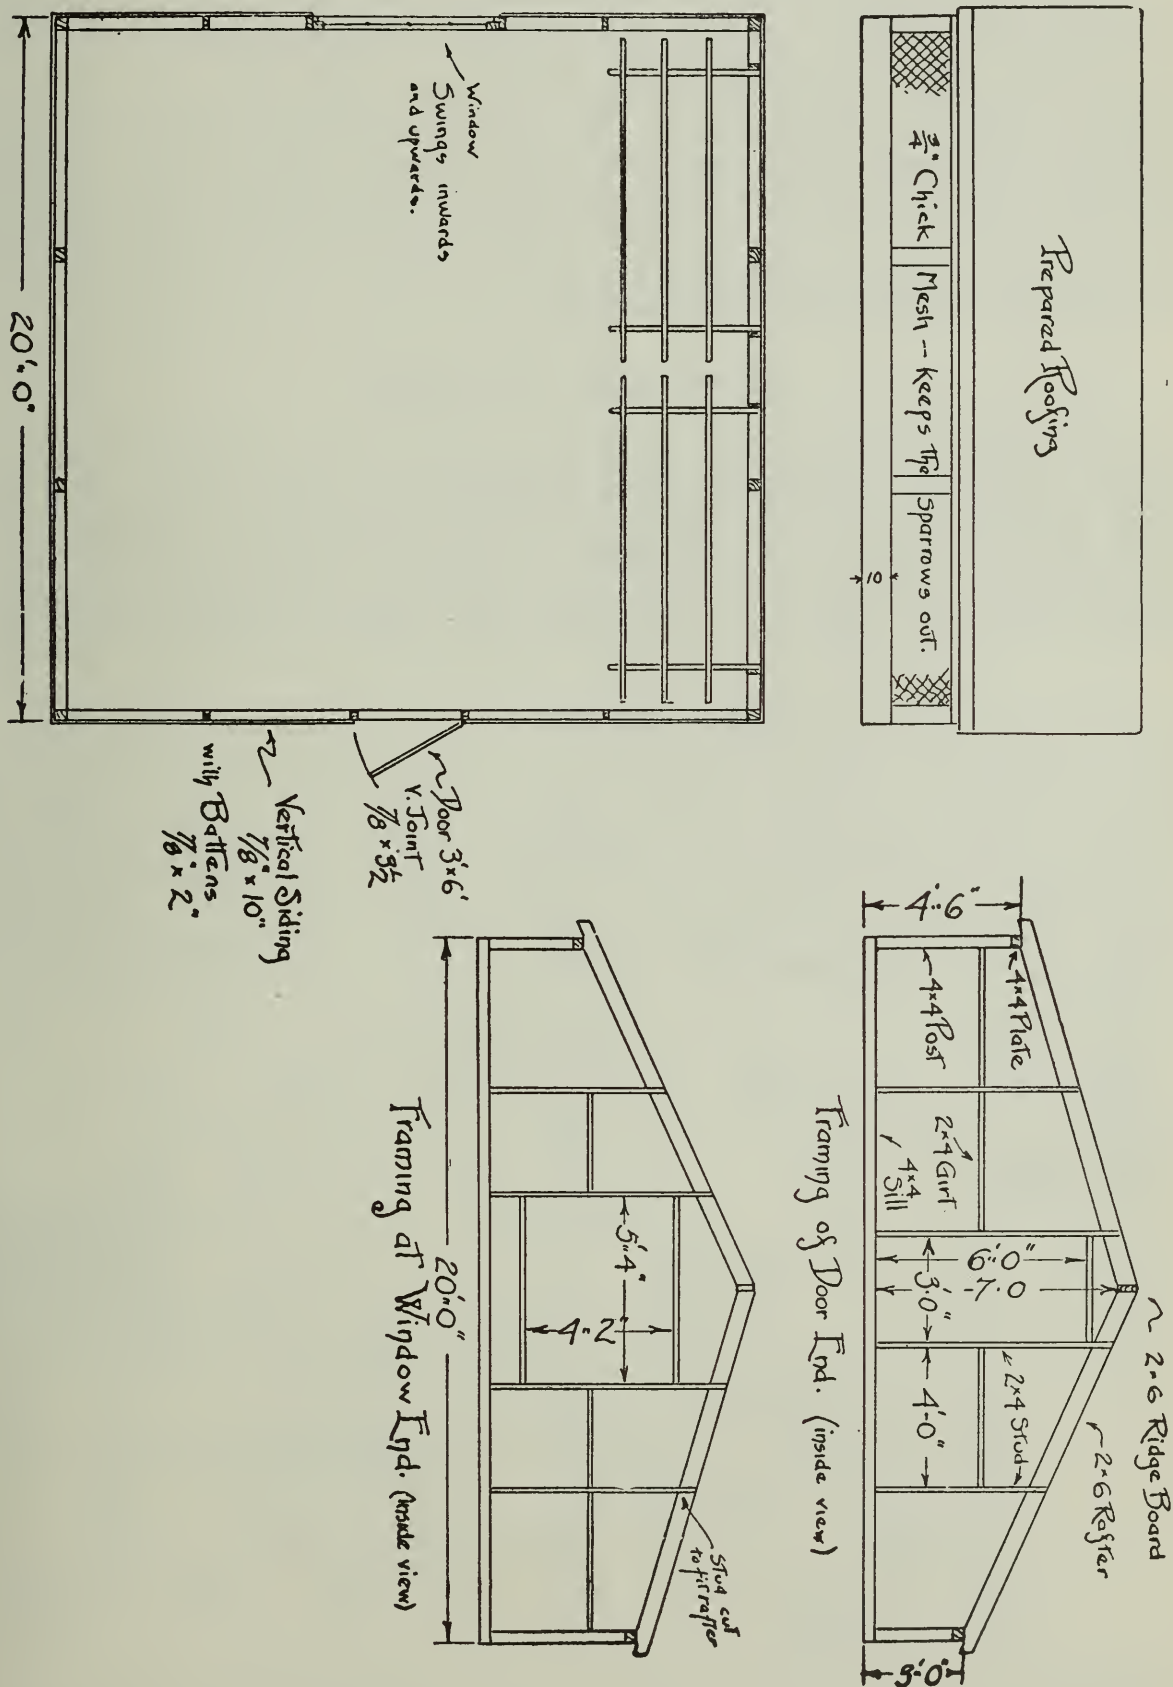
Plan elevation and framing sections of a twenty-foot square Open Front House, suitable for the accommodation of one hundred hens.
